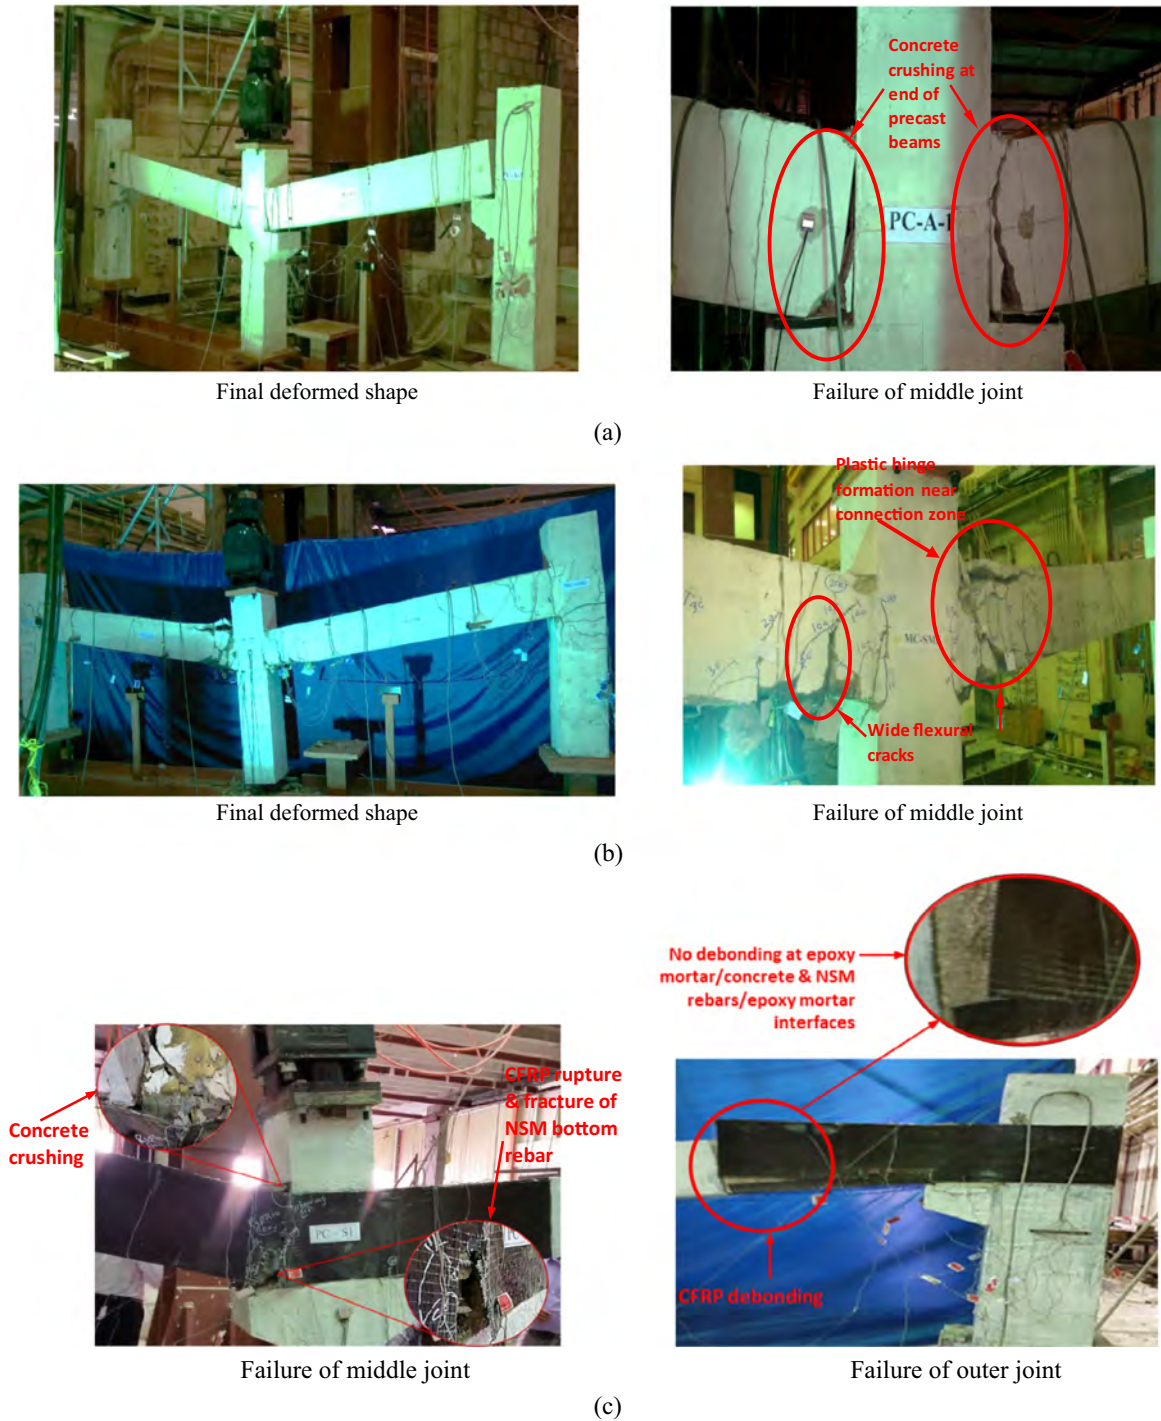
Mode of failure for: (a) Precast specimen PC-C; (b) Monolithic specimen MC-SMF; (c) Strengthened specimen PC-S.
